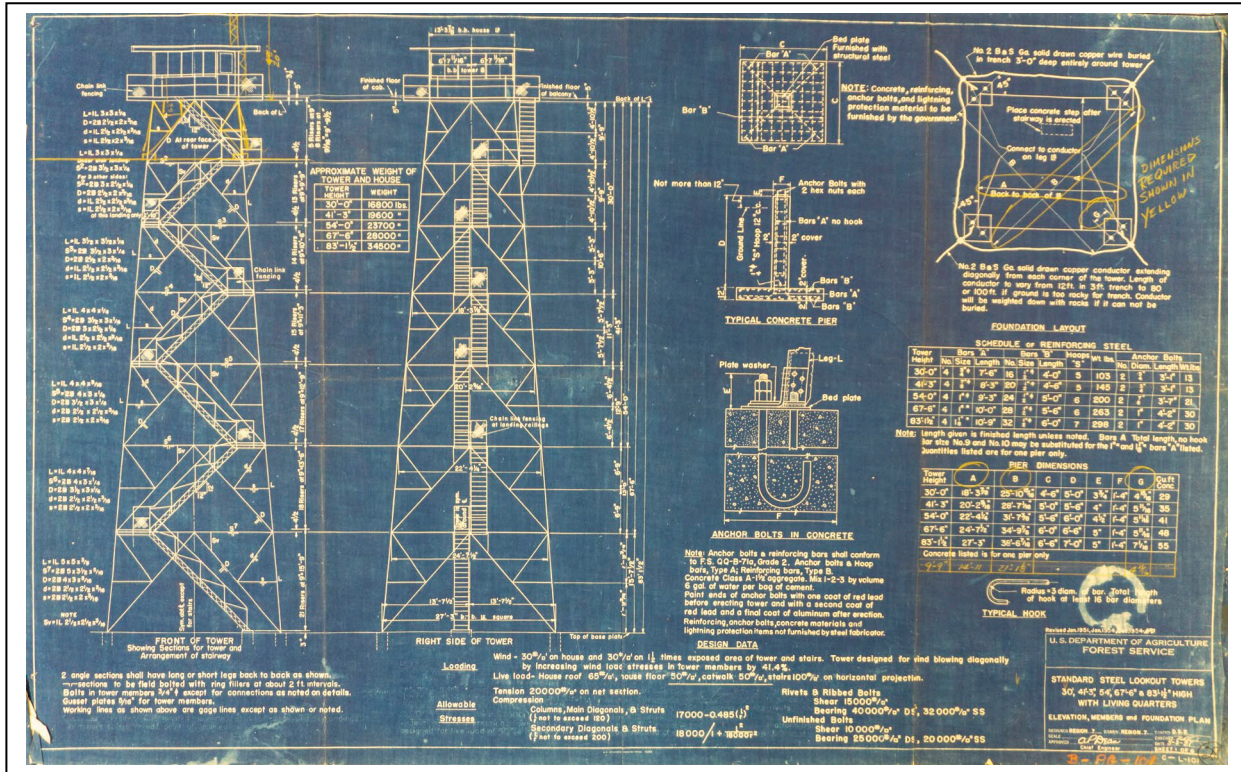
"Standard Steel Lookout Towers," plan provided by the U.S. Department of Agriculture, Forest Service, 1951. Image courtesy of Isle Royale National Park archives at Keweenaw National Historical Park, Calumet Twp., MI.
